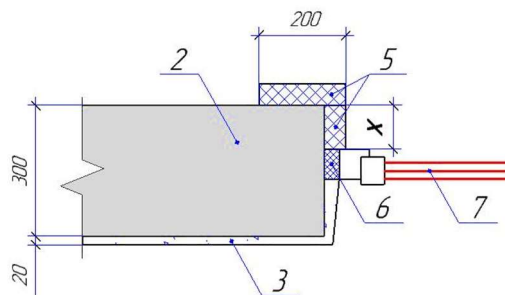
The junction of a metal-plastic window to a precast concrete wall with additional local insulation of a facade
